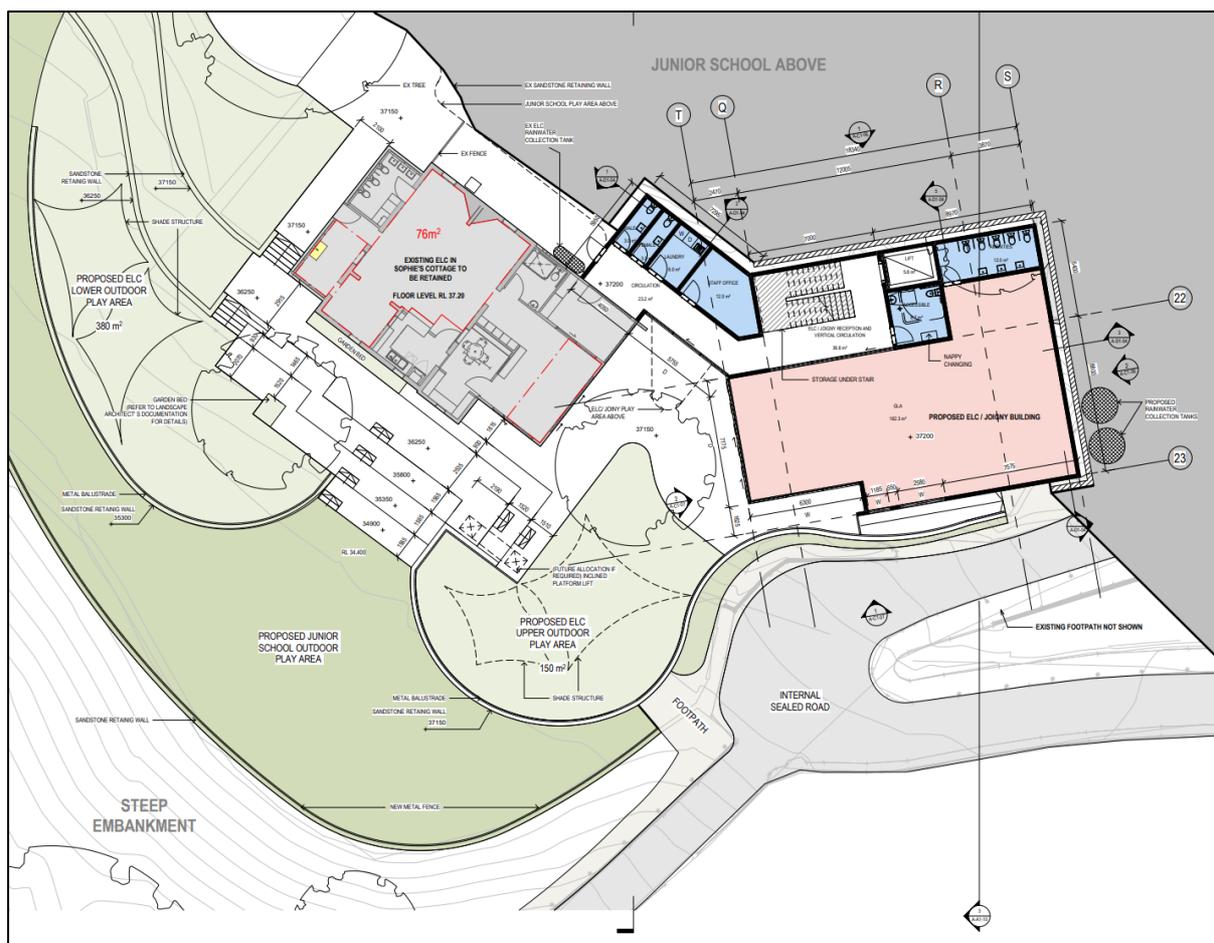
| Precinct A ELC ground floor (Source: Applicant's RtS 2021)
